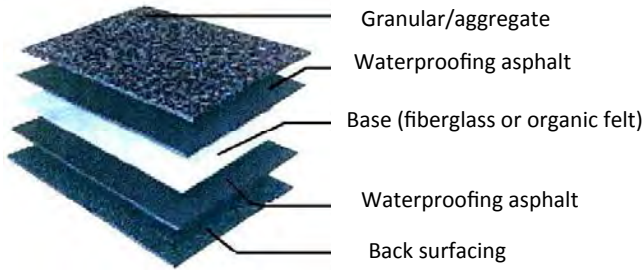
Typical composition of roofing shingles (after Gevrenov 2007).
